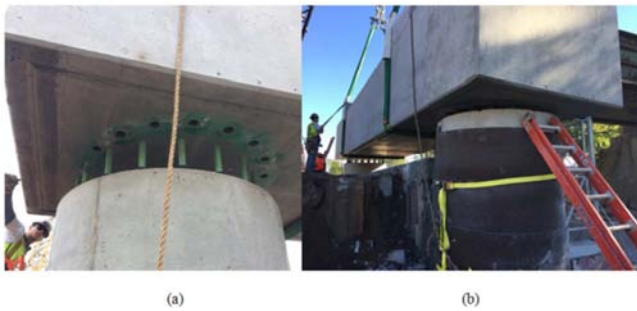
South pier cap beam placing (a) before and (b) after rebar alignment with pier couplers.
